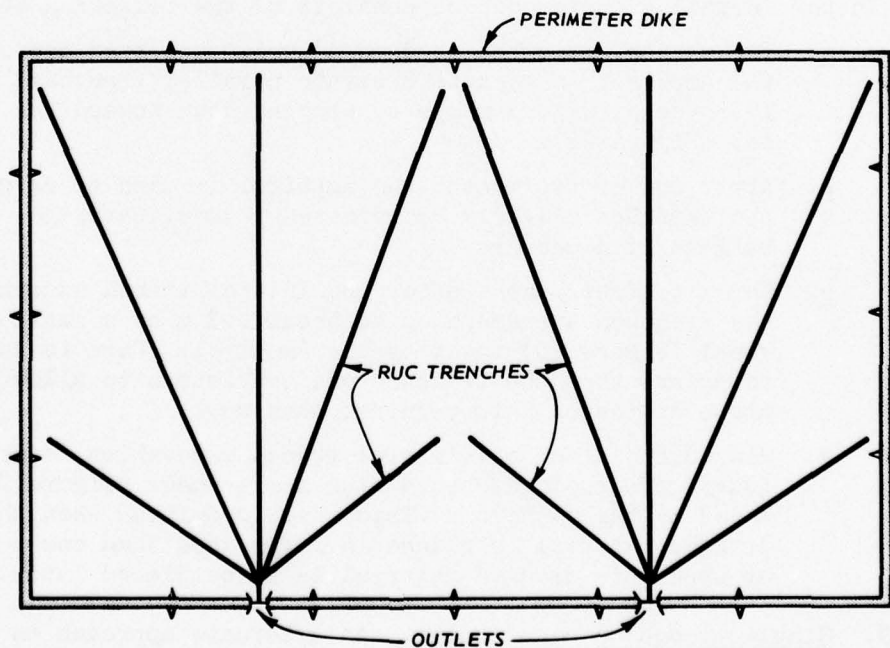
RUC trenching pattern. Note that trenches do not cross each other, because the RUC blocks trenches it crosses
